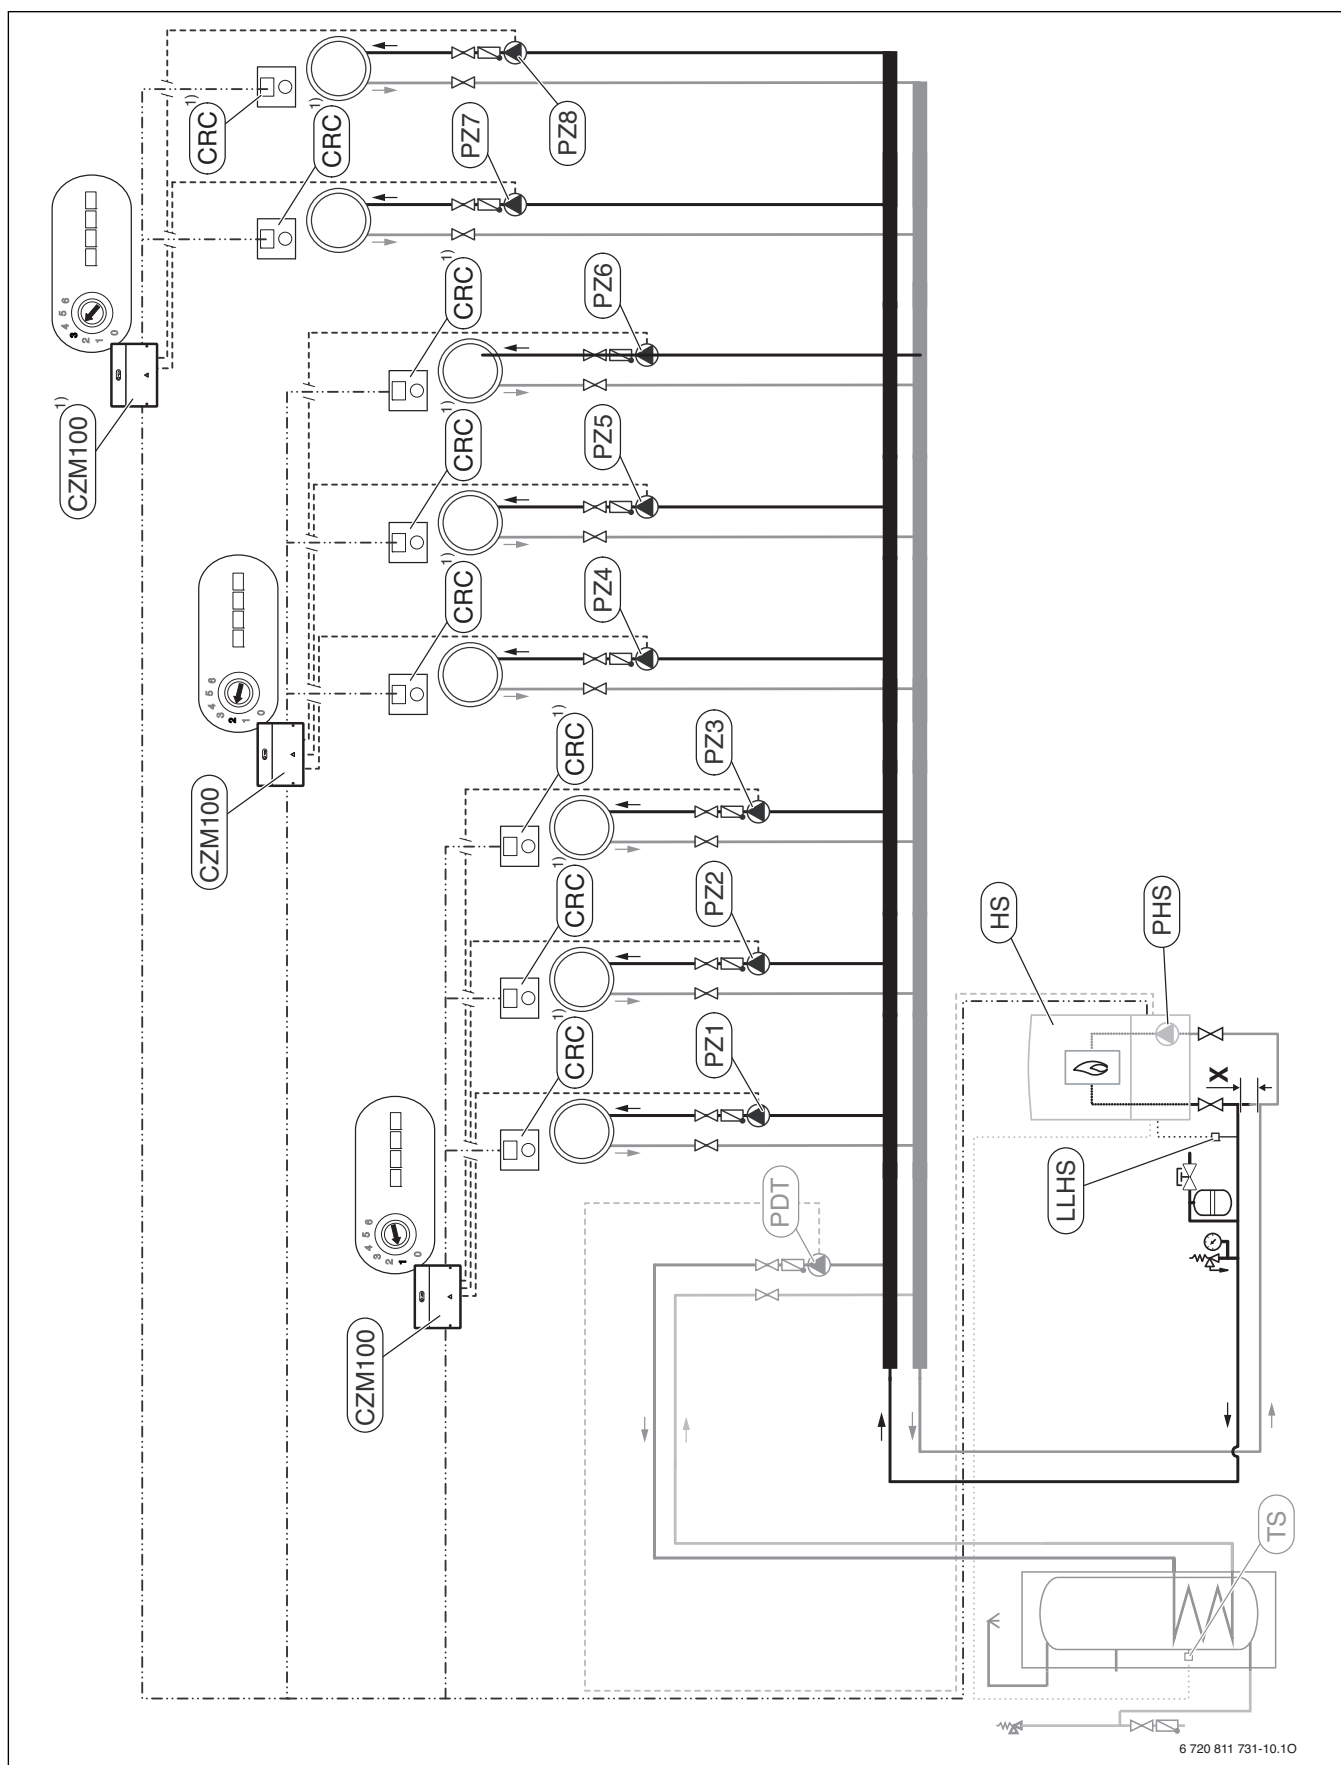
Example of maximum solution with eight heating zones, one IDHW tank zone with a primary and a secondary heating circuit.
